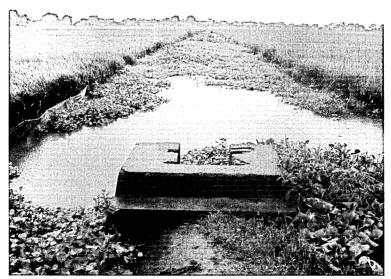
A photograph of the second canal and the concrete box culvert in the rainy season in Phu Lam Commune.
